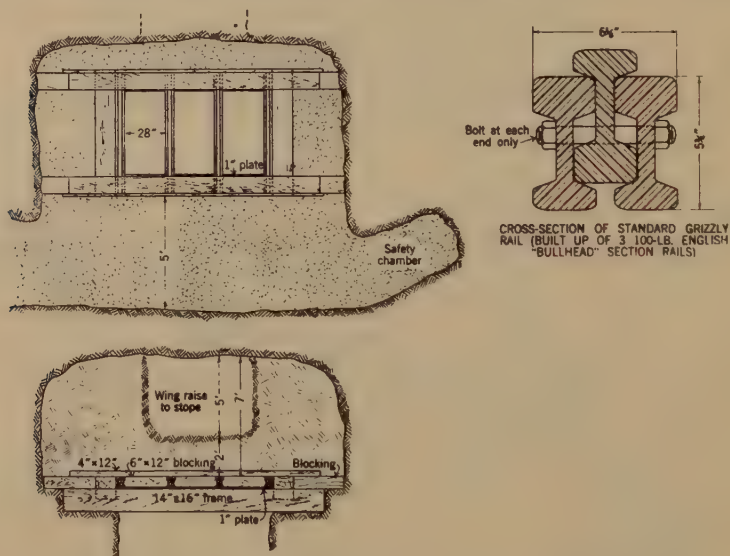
PLAN AND SECTION OF STANDARD BULLDOZE CHAMBER.
